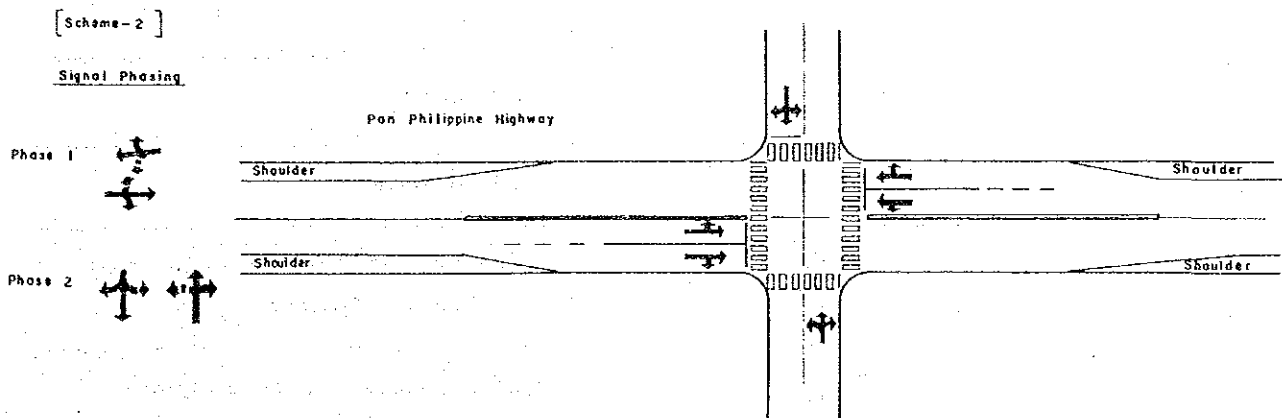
SIGNALIZATION IMPROVEMENT
